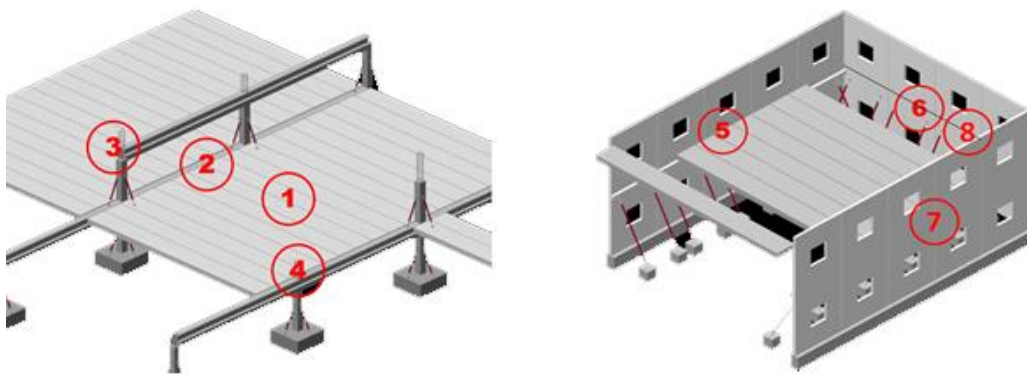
Location of connections in precast concrete structures (Lagendijk & Hordijk, 2016)
